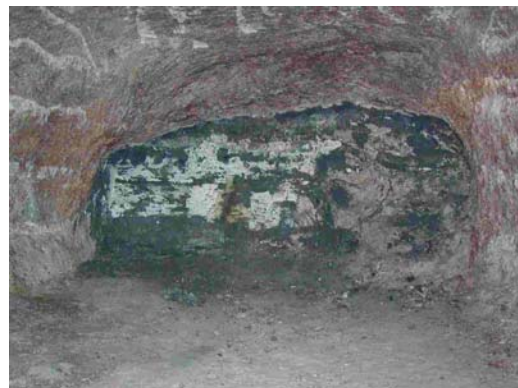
Mining site backfilled by hydraulic backfilling - completed mine cavity -
